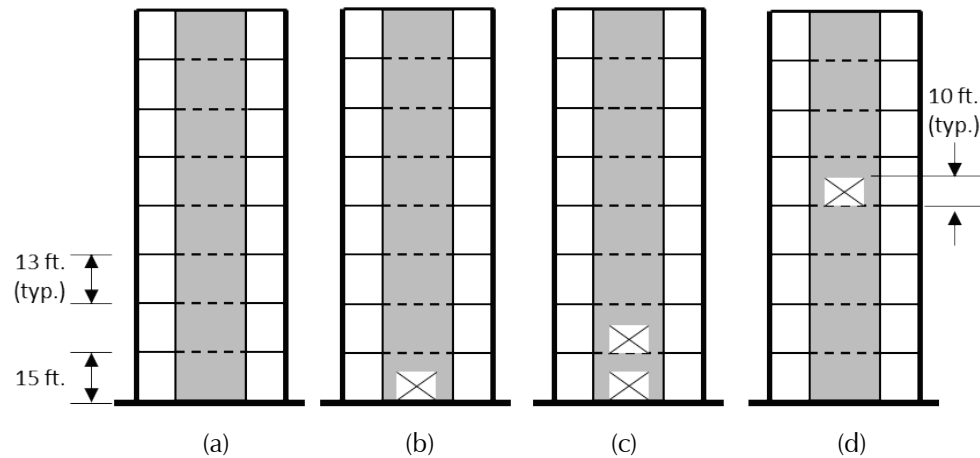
Idealized building elevations (a) without openings; (b) with openings in 1st story; (c) with openings in 1st and 2nd stories; and (d) with openings in upper stories (5th for 8-story building, shown here, and 8th for 12-story building).
